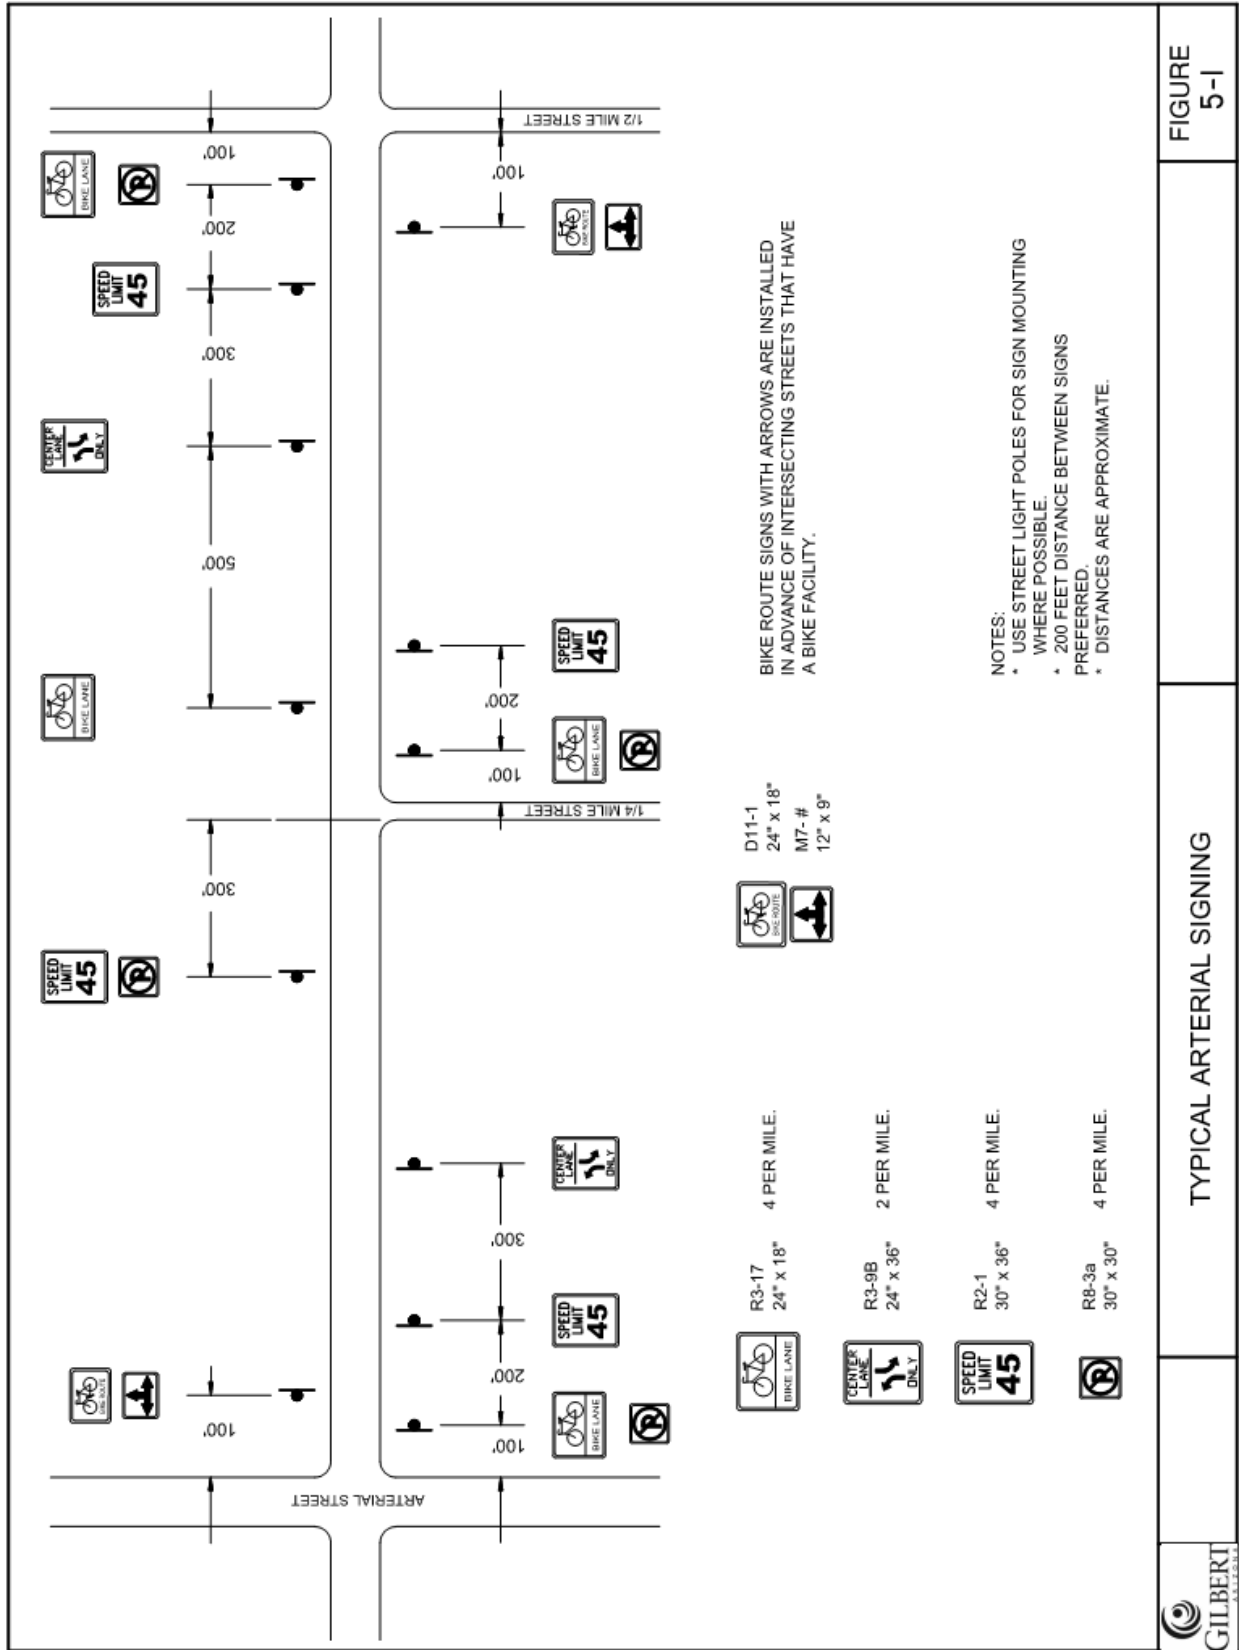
TYPICAL ARTERIAL SIGNING
